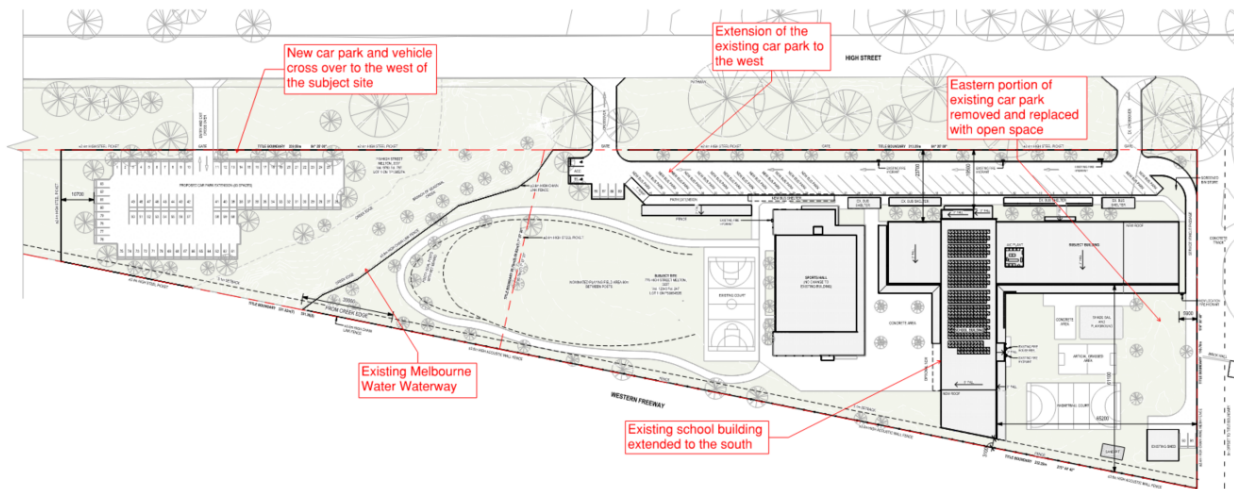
Proposed Development Layout (Image courtesy of DETAIL X Studio).
